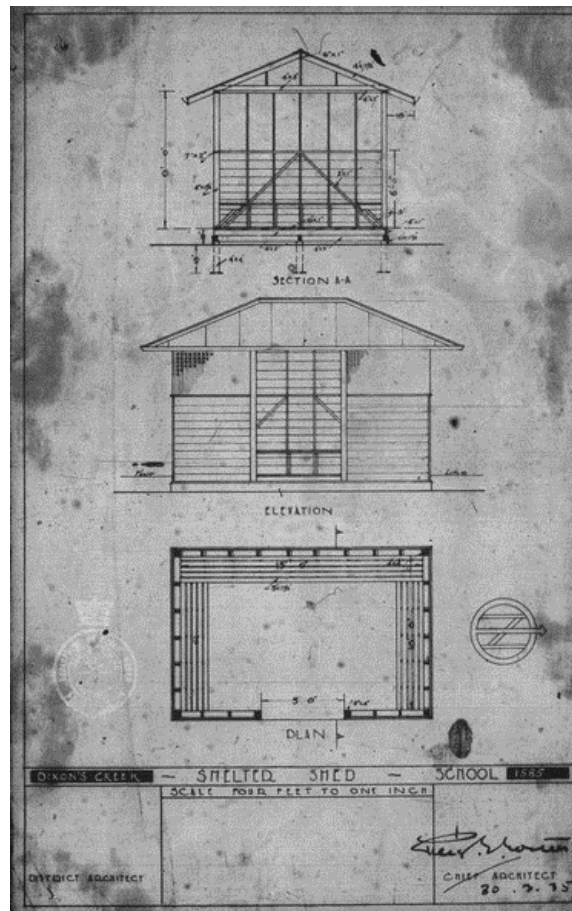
P. Everett, Plan, Elevation & Section A-A drawing of proposed Shelter Shed, Dixons Creek State School, 30 March 1935. Source: Building Services Agency (BSA) drawing, SSO1585.2, Public Record Office Victoria.
